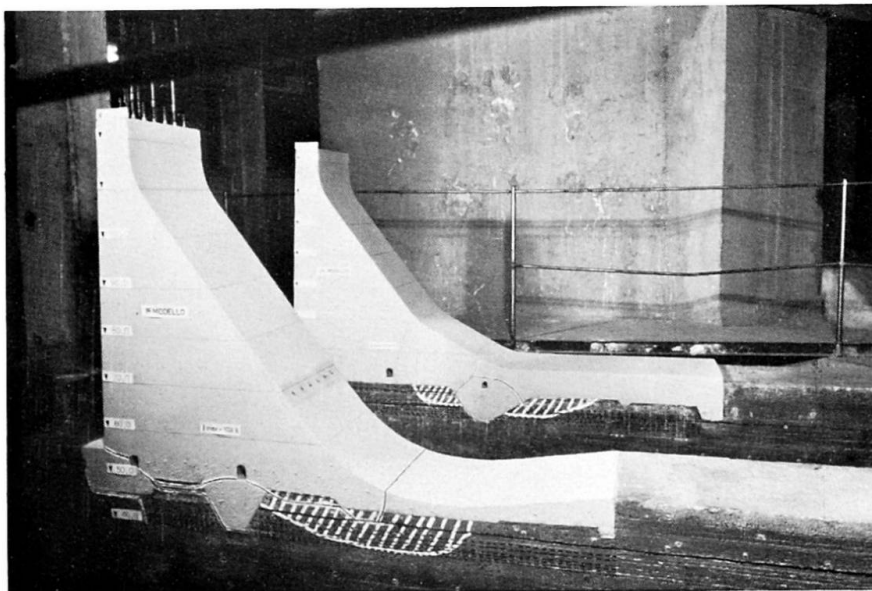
Mequinenza Dam, Spain. Plane model on geomechanical foundation.
